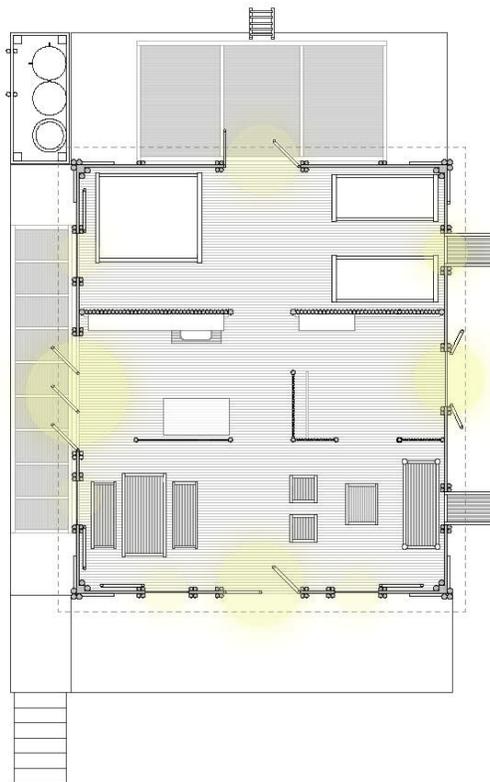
, Proposed Floor Plan: Daylight (Source: Author)
